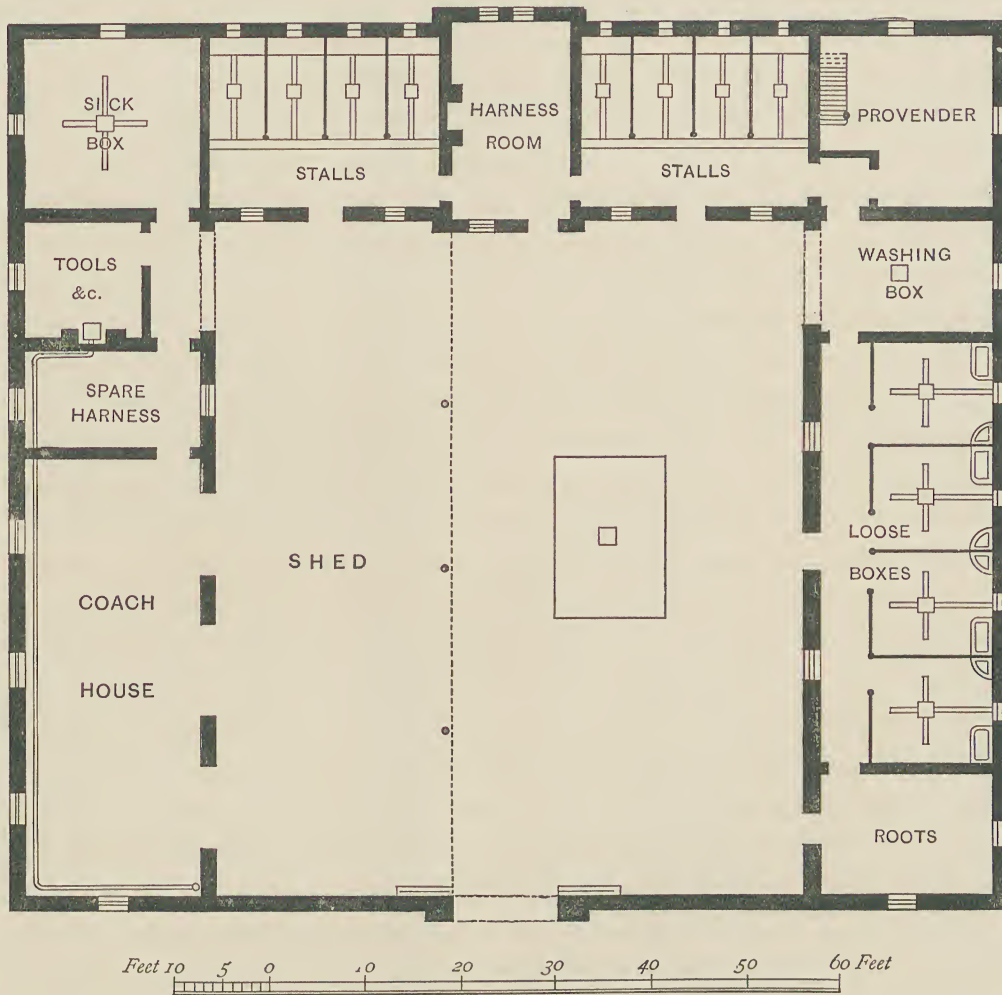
Plan of Stable-buildings for Twelve Horses.
